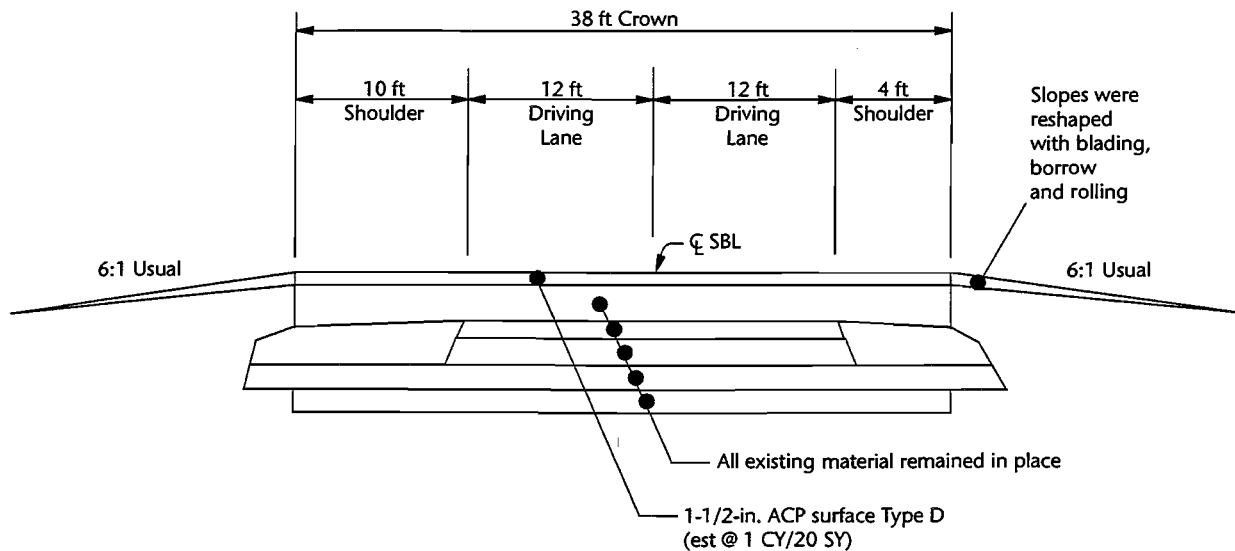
Post-construction cross section of F0A (1 ft=0.304 m, 1 in.=2.54 cm)
